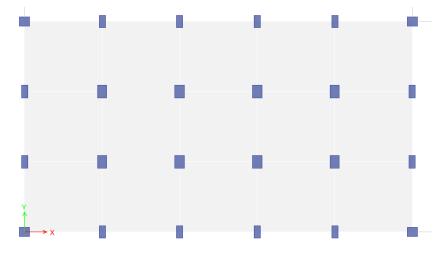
Plan view of flat plate model corresponding to RC frame Model in ETABS
